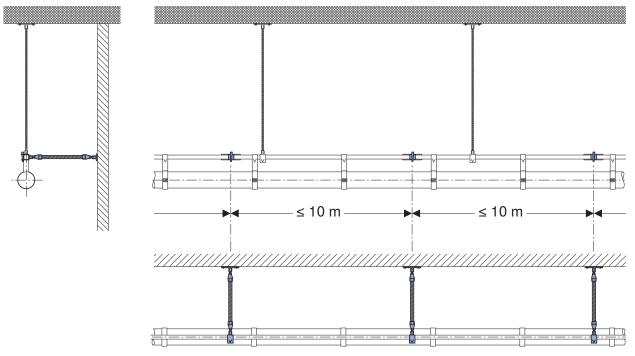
Positioning of Geberit Pluvia support sets installed sideways on the wall
